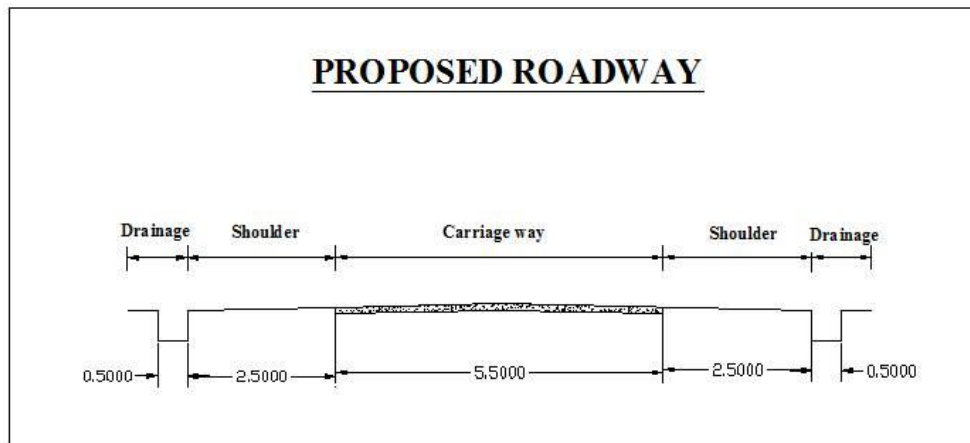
Proposed Road width of Kabaka Puttur Railway Station Road
